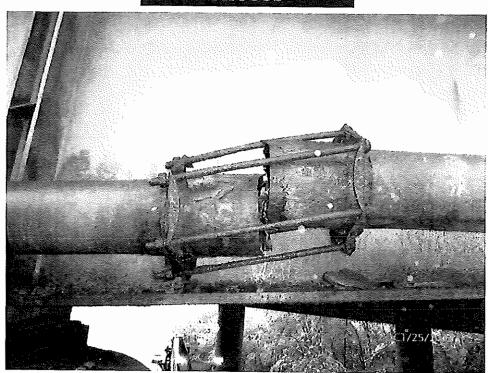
At Pier 2, the drainpipe is disconnected, and is leaking onto the roadway below.
